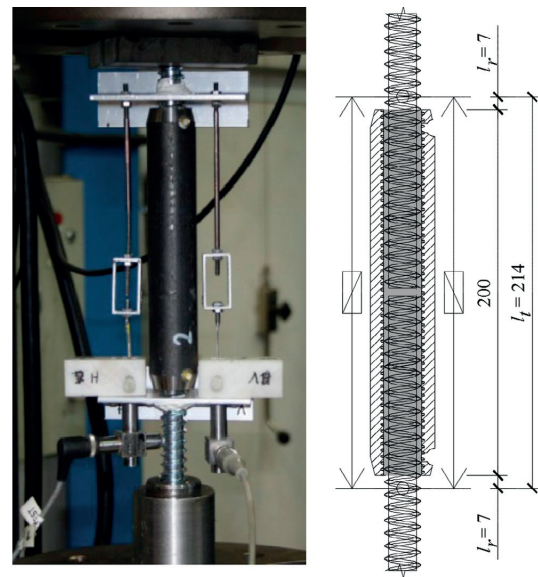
Test set-up of tensile test of the rod splice (dimensions given in mm).
